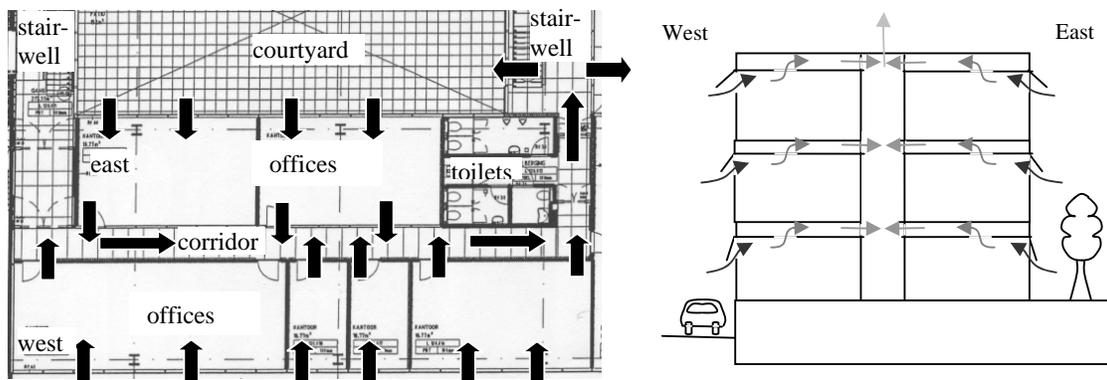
Operation scheme of natural ventilation on a floor plan (left) and on a cross section (right)
